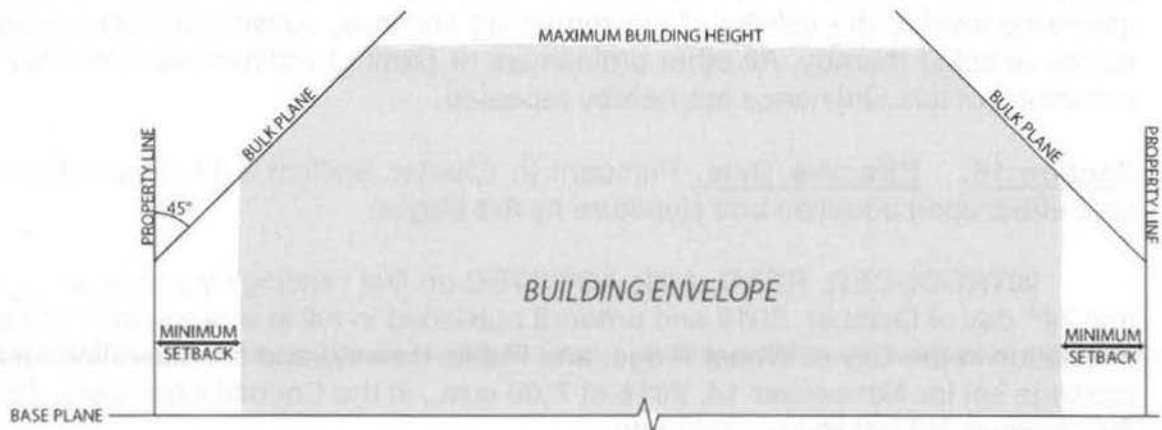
Section view of bulk plane building envelope, as measured from all property lines.
